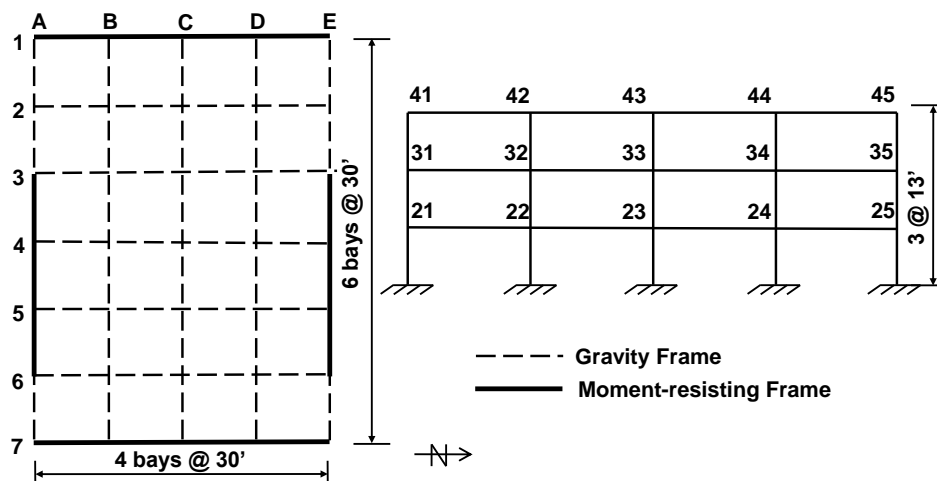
Floor plan and elevation for the frames SE3 and BO3 (FEMA 2000a)
